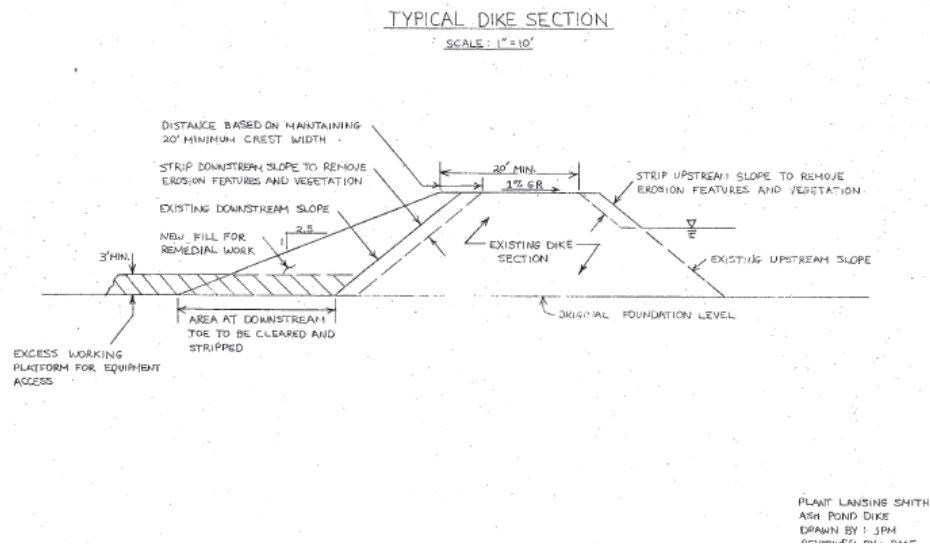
a: Ash Pond Impoundment Remedial Work Cross-section
